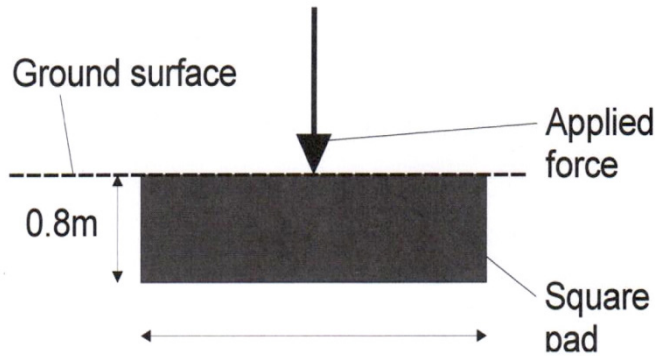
Example 2.1 Pad foundation on dense sand design situation
